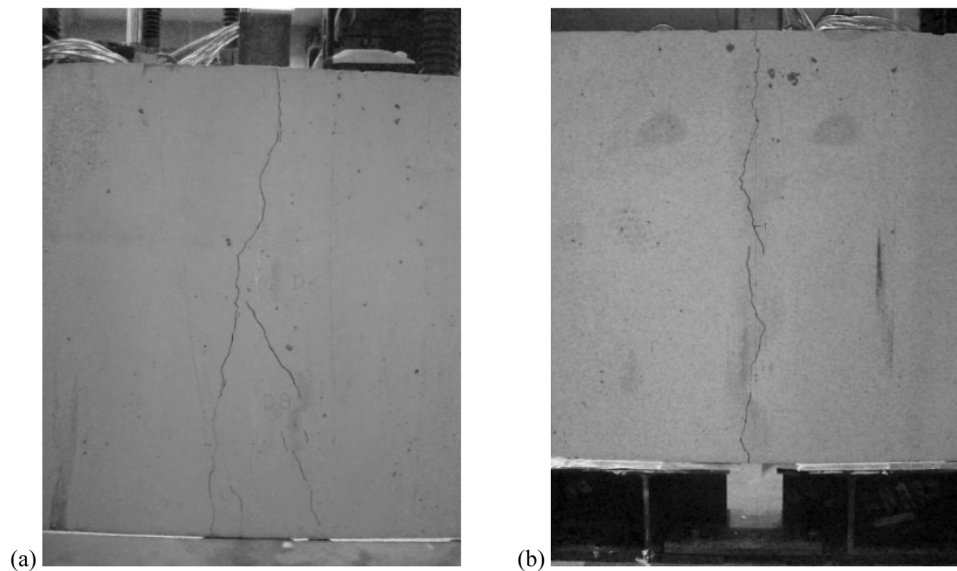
Crack patterns observed during failure of (a) Specimen F and (b) Specimen G.
